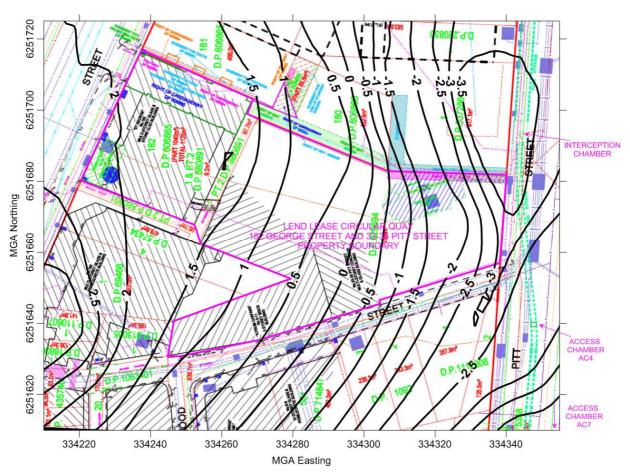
Inferred Elevation of Top of Class III/IV Sandstone (contours show elevation in metres AHD)
